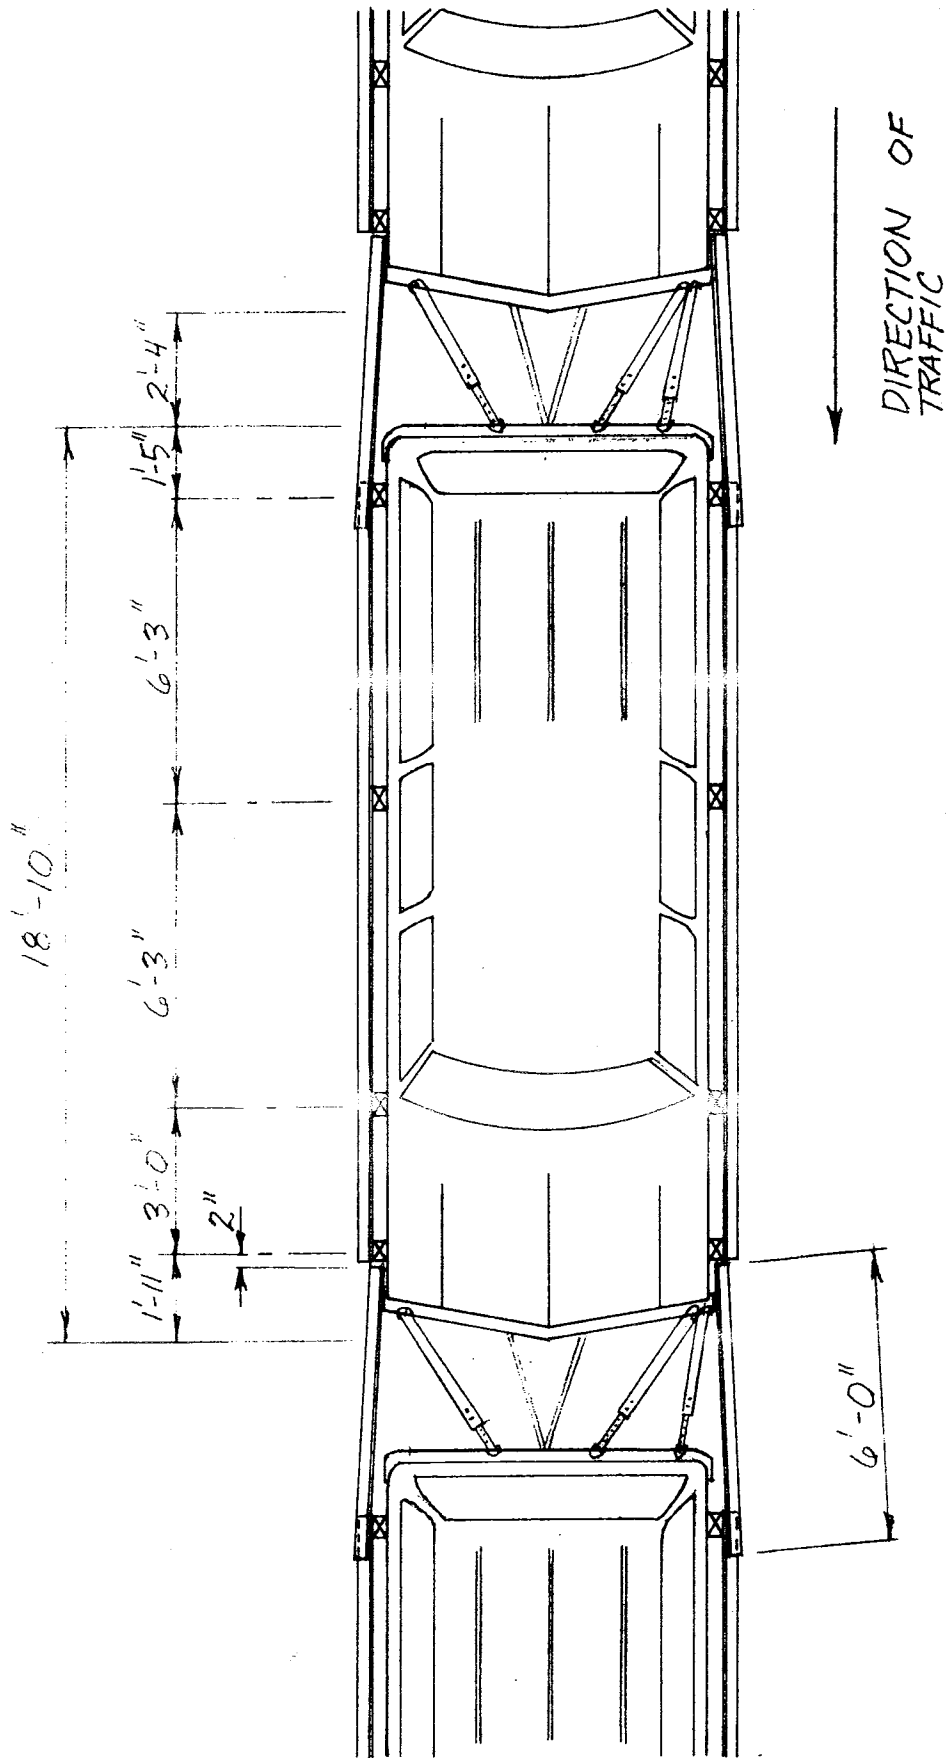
CONSTRUCTION DRAWING OF USED CAR BARRIER.
